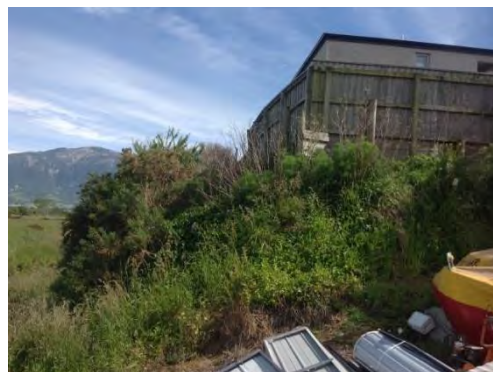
Failure of retaining wall (– date to be added in V2.0 of report, S42.3973, E173.6798, facing N).
